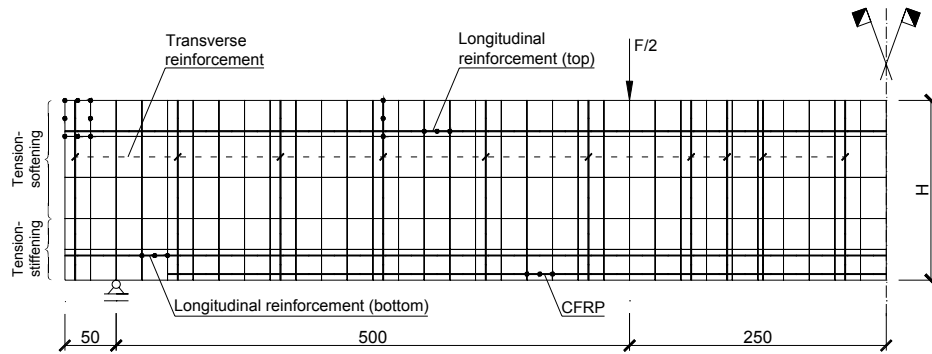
Geometry, mesh, loading and support conditions of reinforced concrete beams strengthened with CFRP strips. Perfect bond between the CFRP and concrete is assumed. Note: all dimensions are in millimeters.
